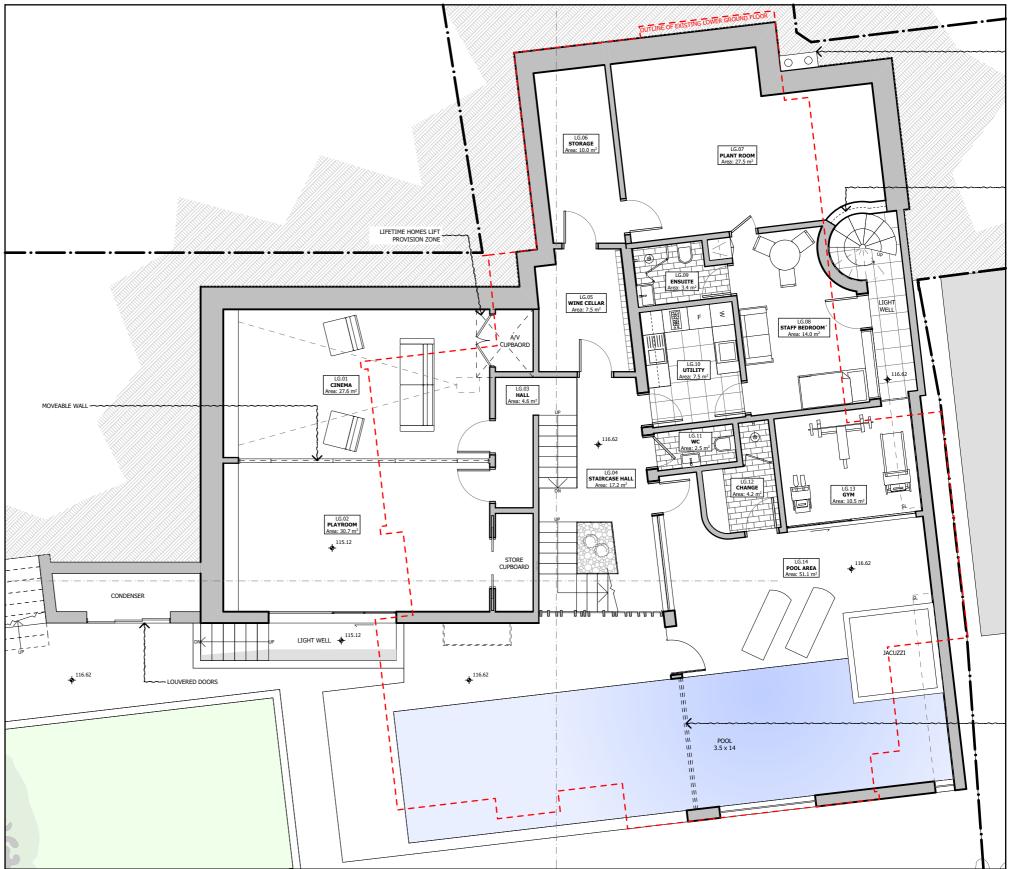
Lower Ground Floor plan (NTS). Author: SHH
